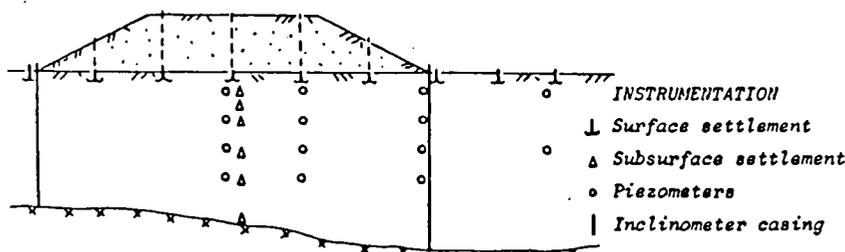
Instrumentation normally used for embankments on soft foundations (7, 235).
